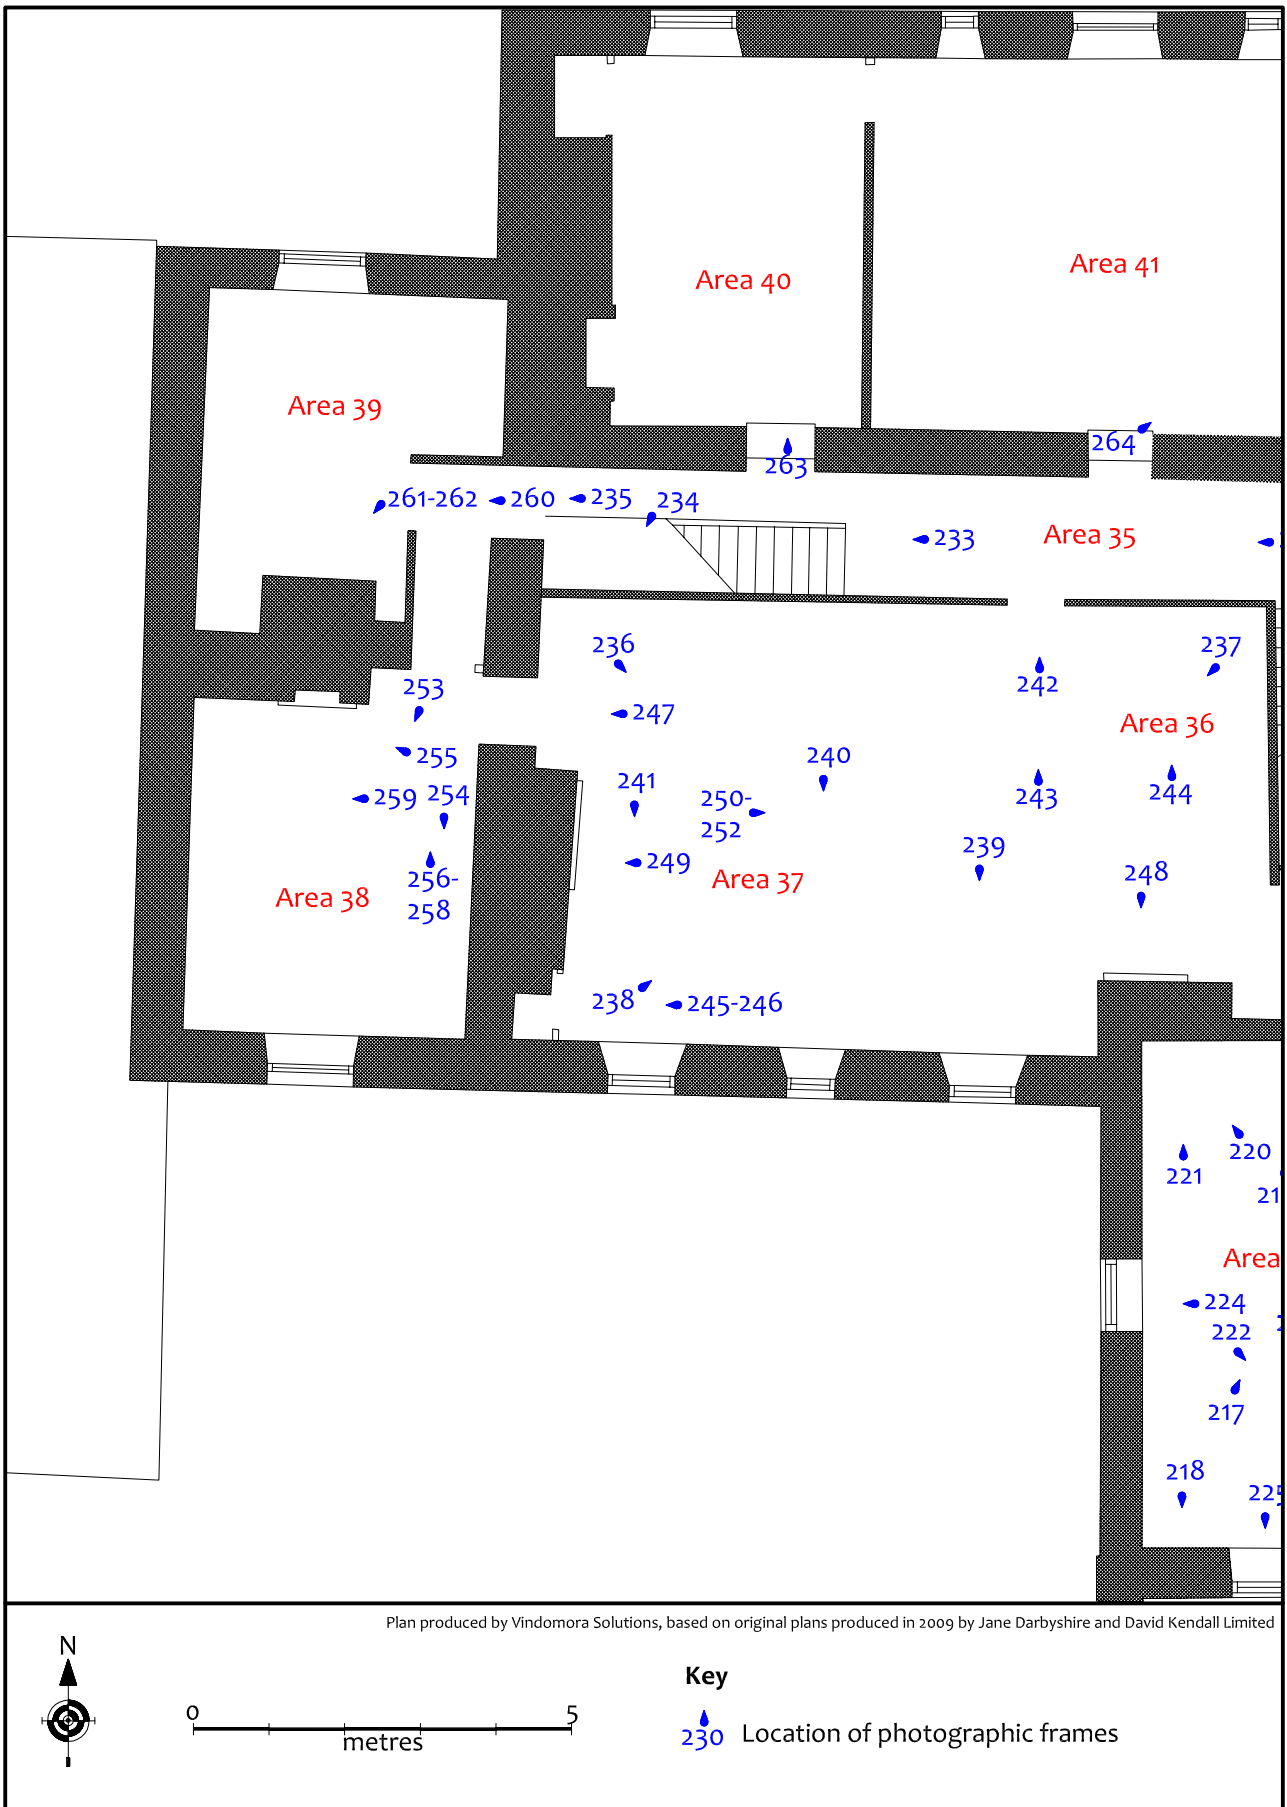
Mezzanine floor plan showing location of photographic frames. Areas 35-41
